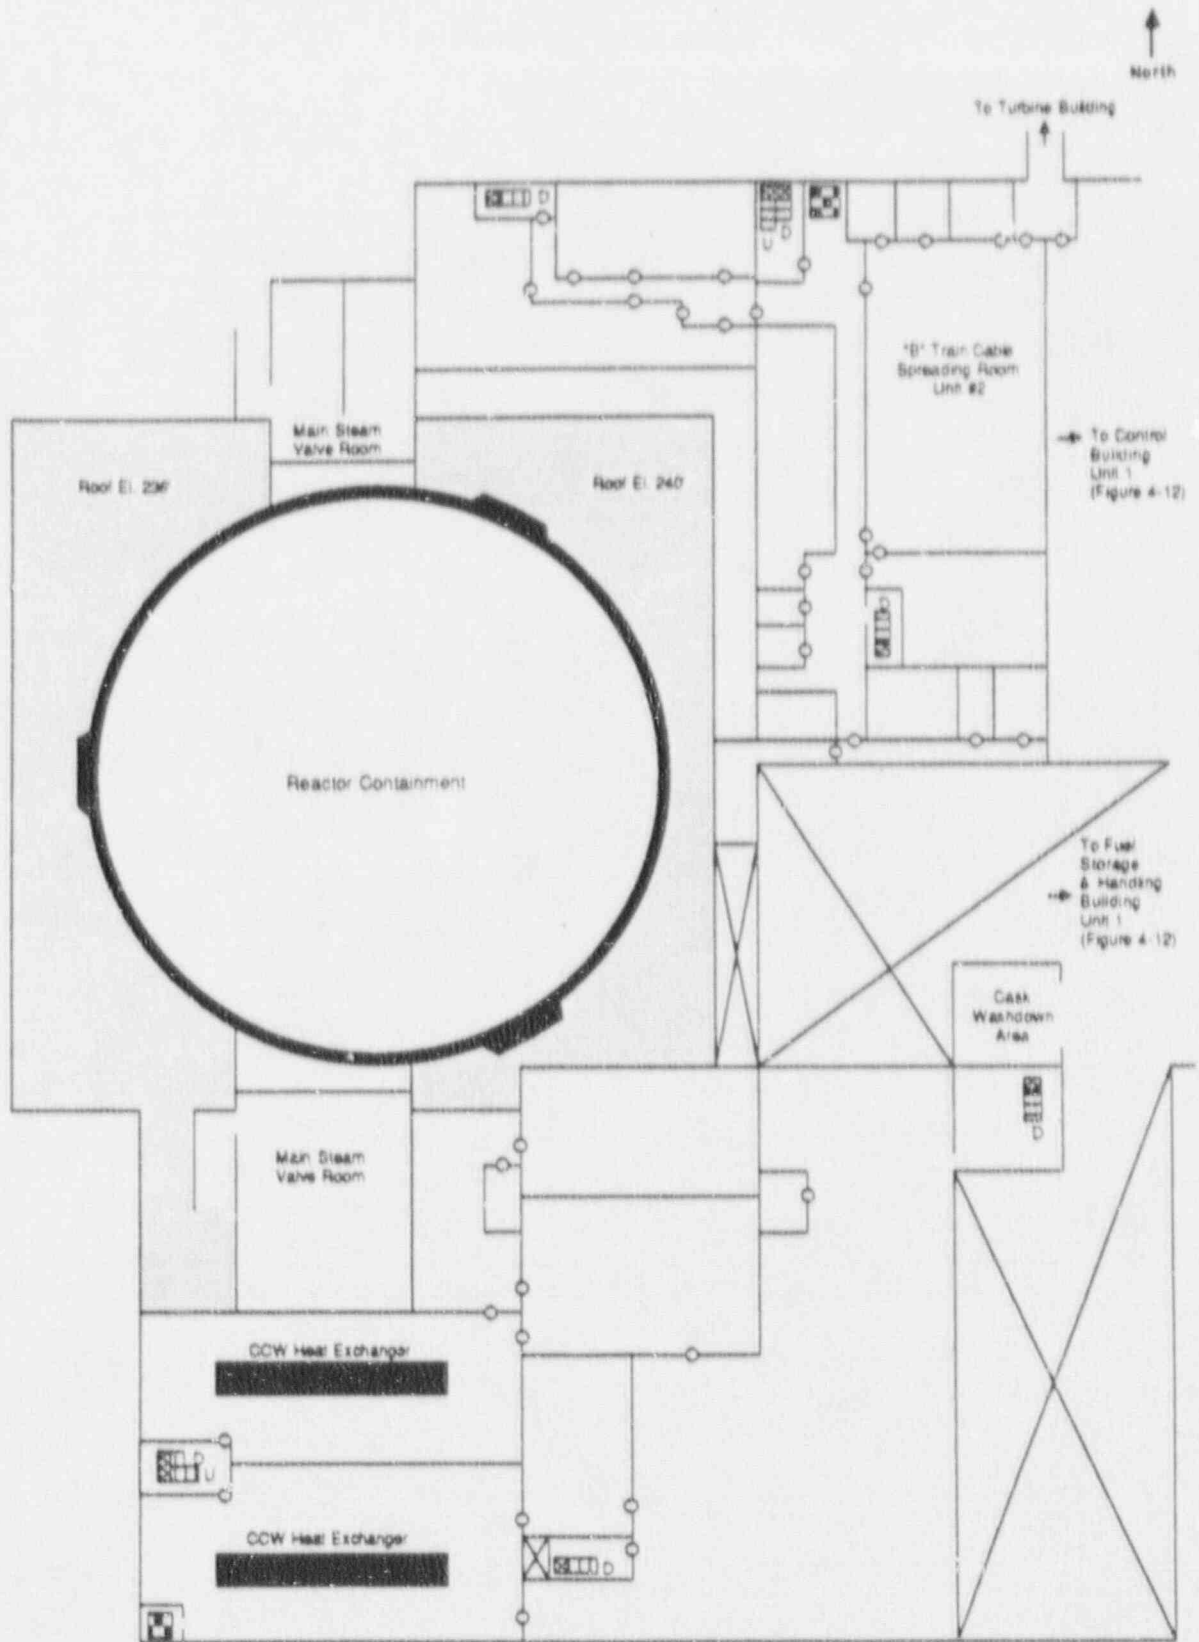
Vogtle 2 Reactor Containment, Control Building, Auxiliary Building, and Fuel Handling Building, Level 2 (Elevation 240'-0")
